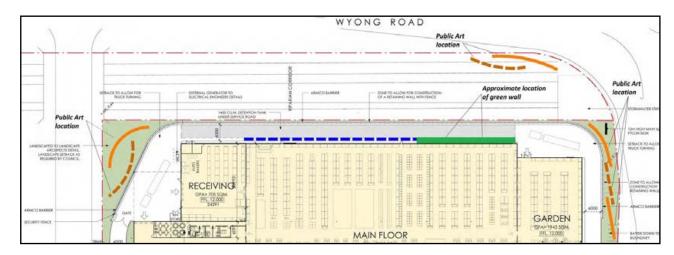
Plan showing location of proposed public art at the Wyong Road/Tonkiss Street intersection and the intersection of Road 2 and Wyong Road.
